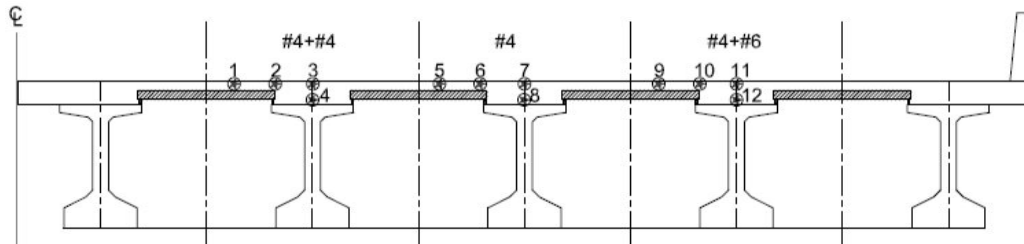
5 San Marcos SH123 Bridge Elevation View Drawing (TxDOT)
